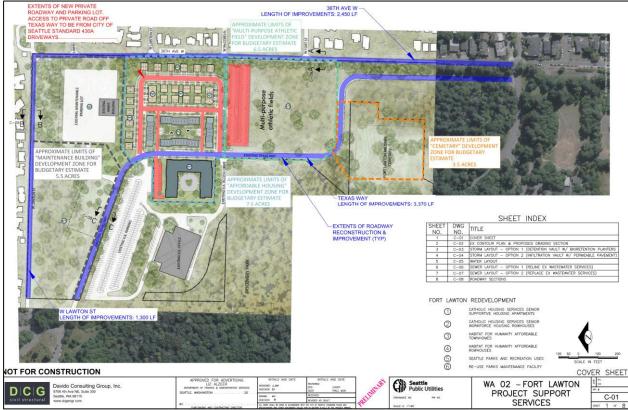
DCG Civil Site Plan from 2022 Estimate
